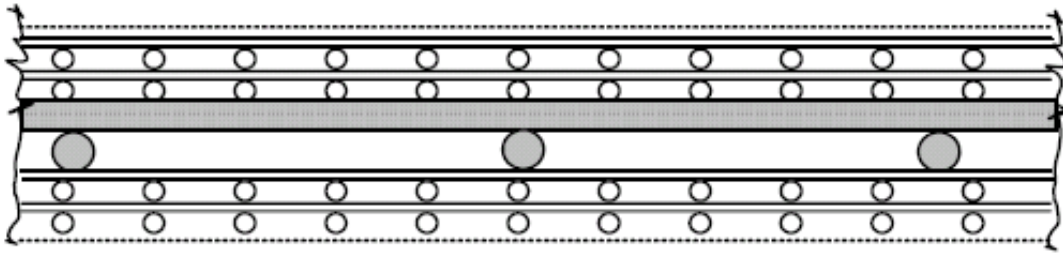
Detail section of wire mesh and steel reinforcement configuration for ferro-cement
